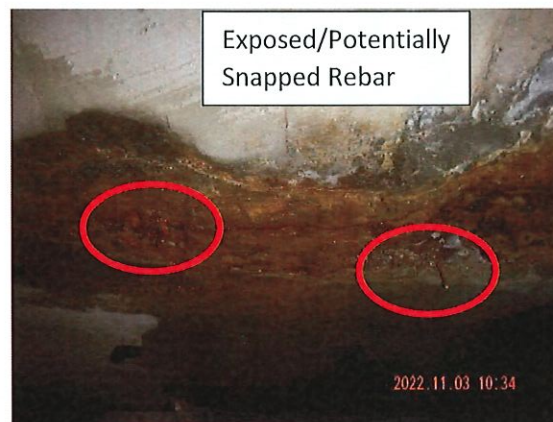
description: Seepage and Broken Rebar near Joint Between Back Wall Left Riser Box and Left Box Spillway
